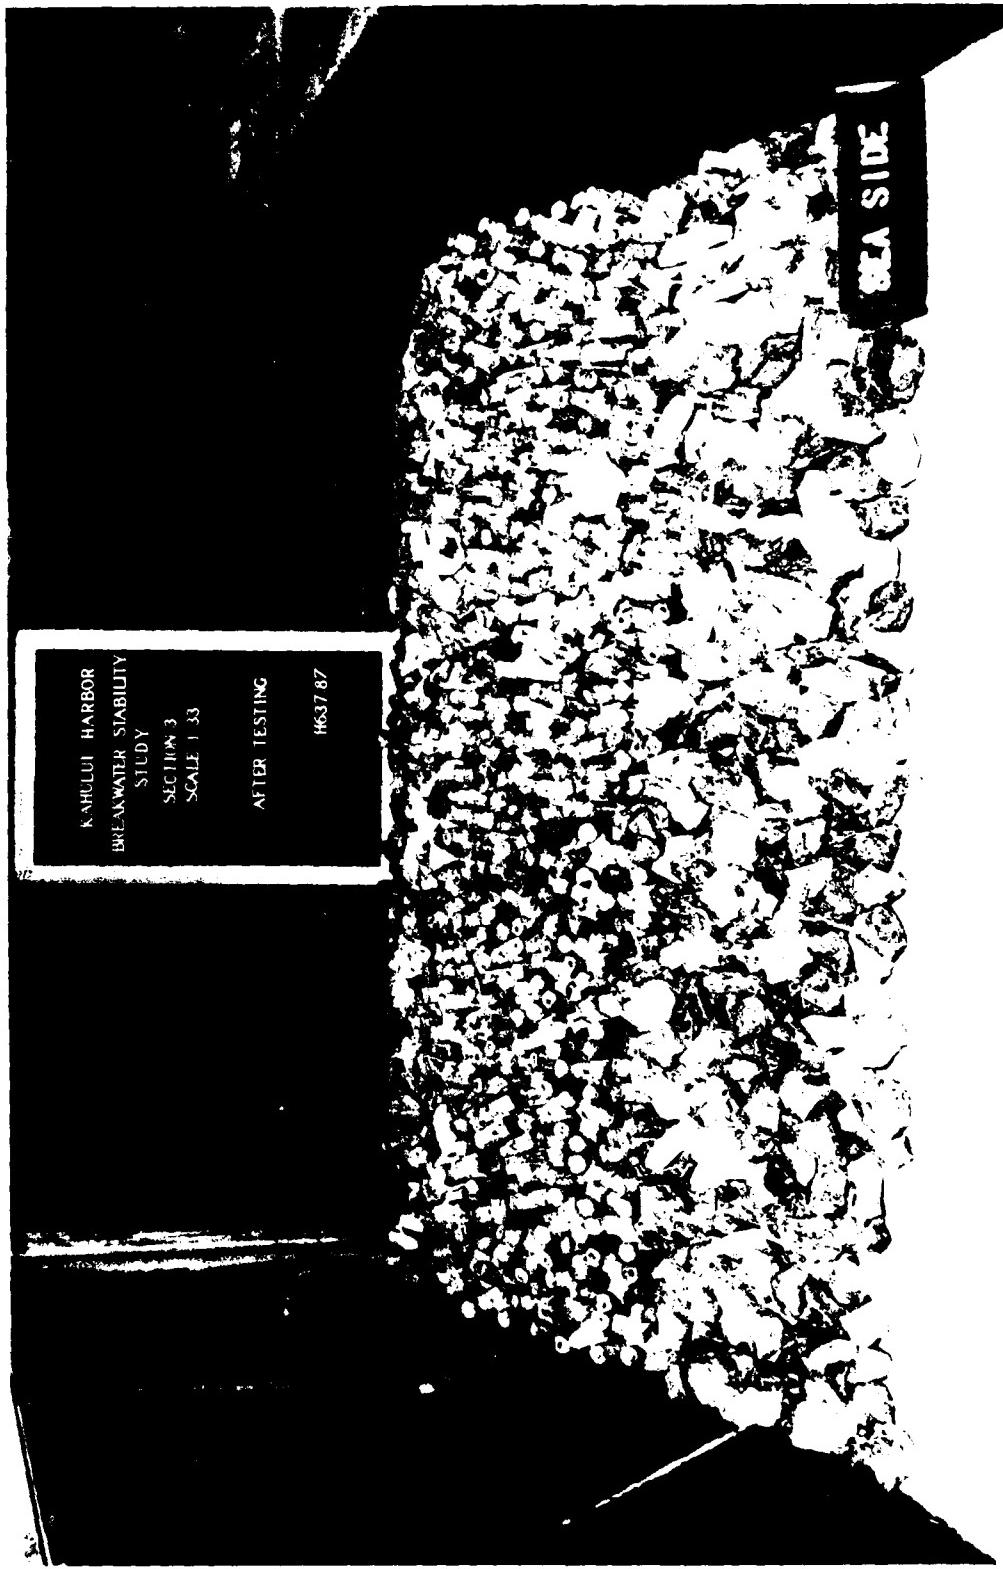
Sea-side view of Plan 2 after testing, 1st test
